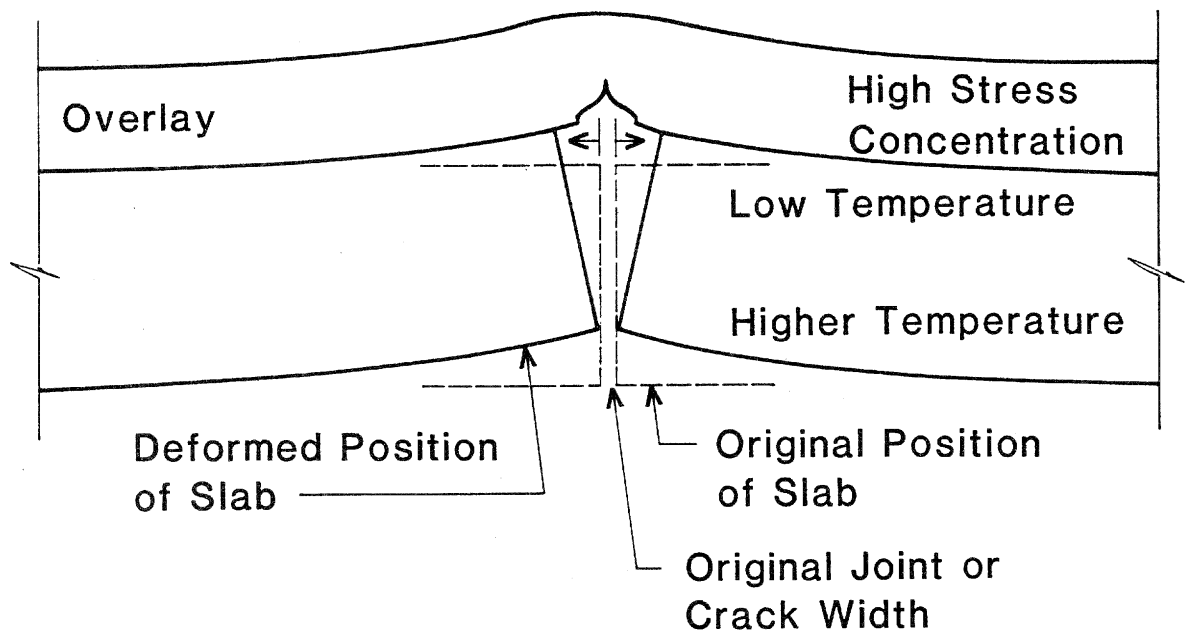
Stress Caused by Thermal Curling of the Pavement Slab Due to Temperature Differential Through the Pavement Slab (2).
